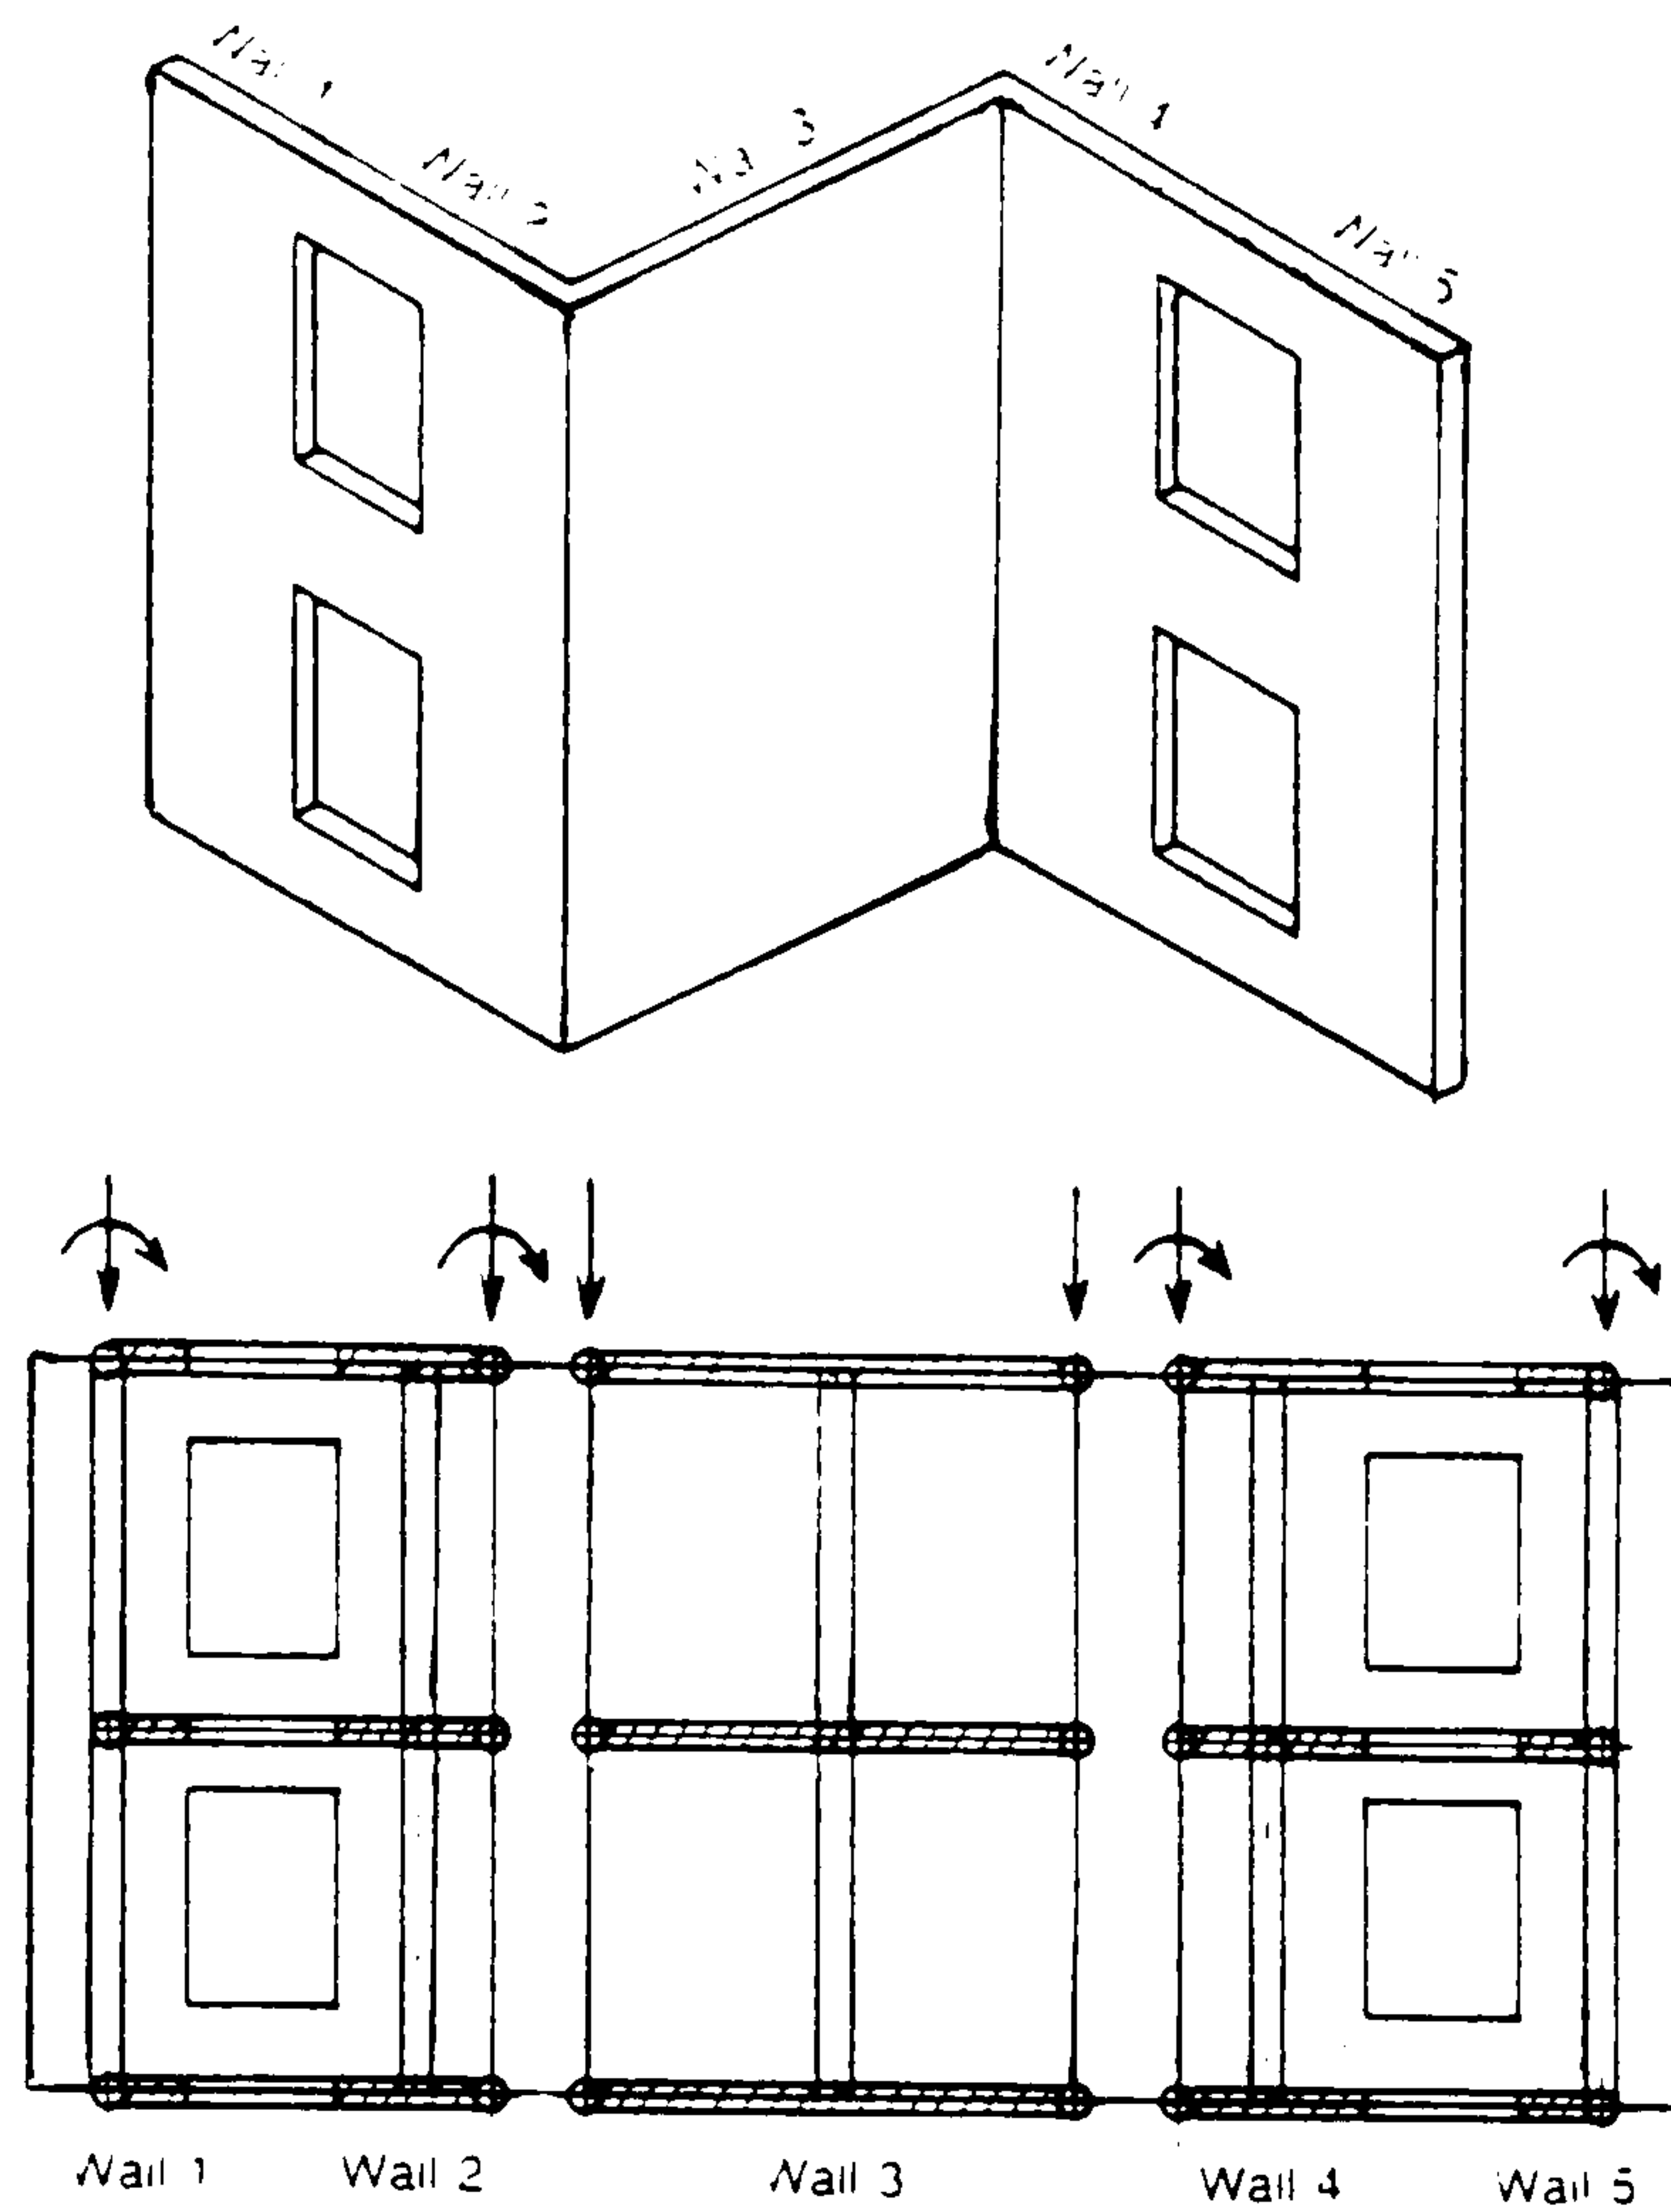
Macleod and Hosny's [39] test arrangement for wall connected to beams at one edge and another wall at another edge
